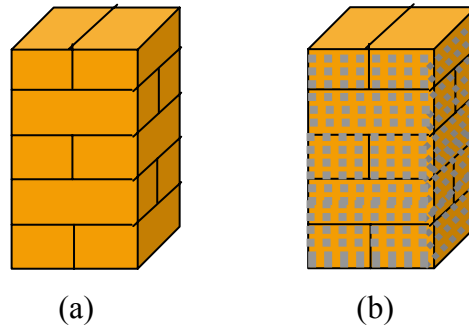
(a) Brick Column, (b) Mortared and Comforted Column
